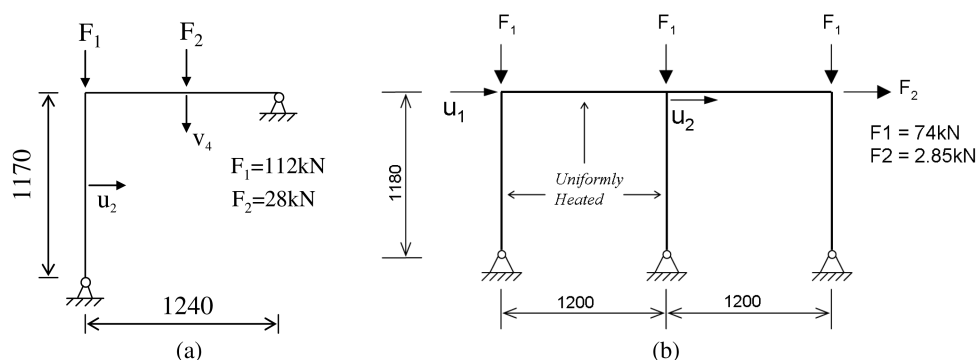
Schematic of the tested steel frames (mm): (a) frame EHR3; (b) frame ZSR1
